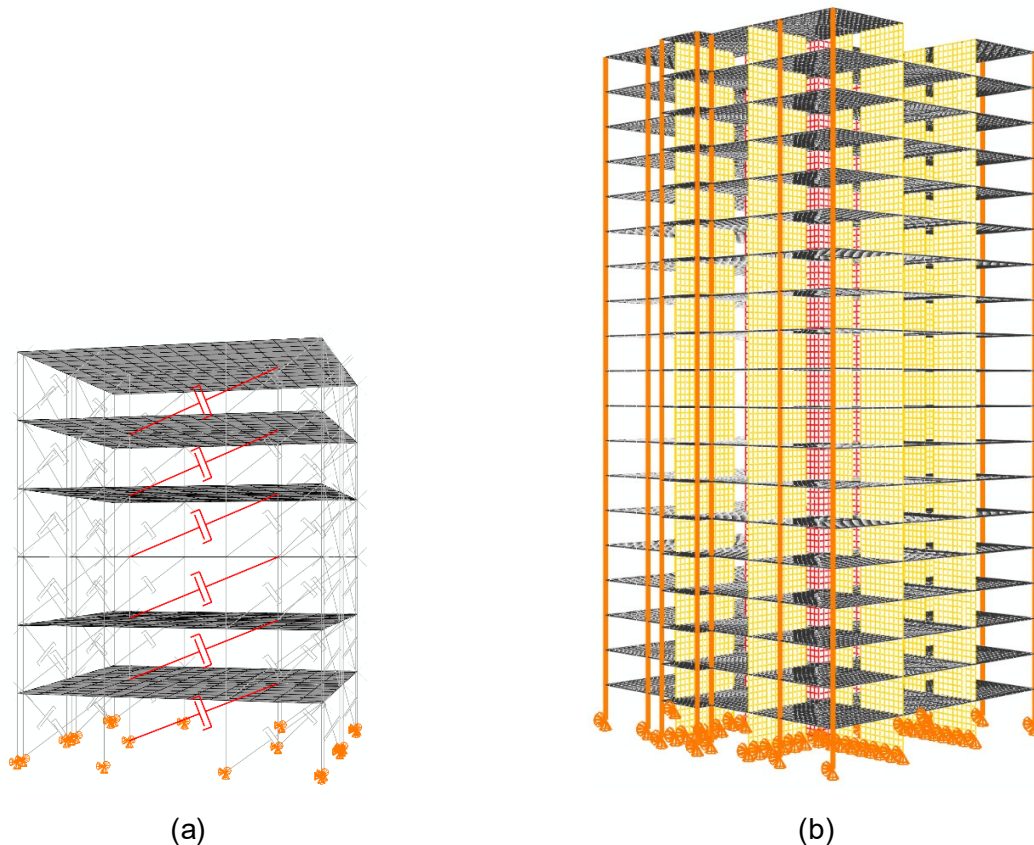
Finite element models for timber structures: (a) 6-storey light-wood-frame building; and (b) 19-storey mass timber building (Checker) on a unshown concrete podium.
